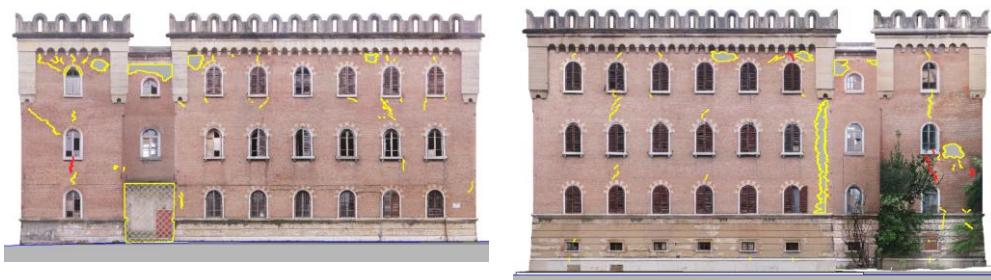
Crack pattern and damage survey of the West (left) and East (right) façade
